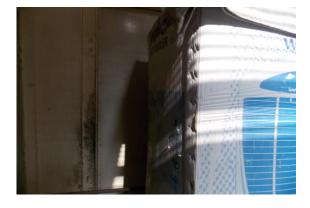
Wall No. 2 of Kitchen No.1 of Second Floor Locked
